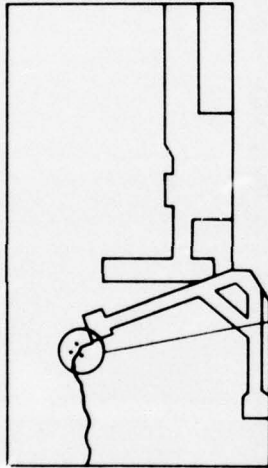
Crack and gage locations for strain instrumentation in the middle wall gate bay monolith, M-5.
